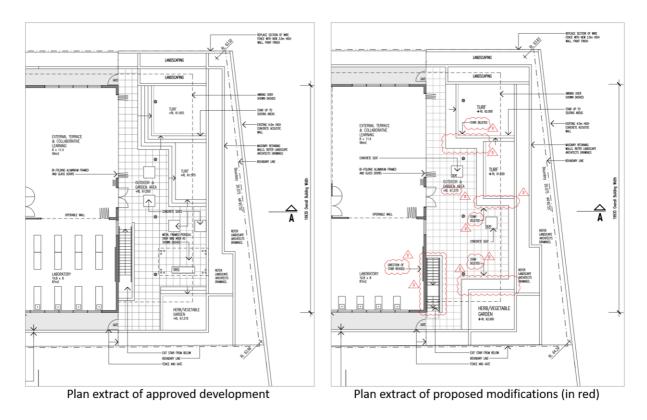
| Approved (left) and proposed (right) external garden area (Source: Applicant's Modification Report, 2022)
